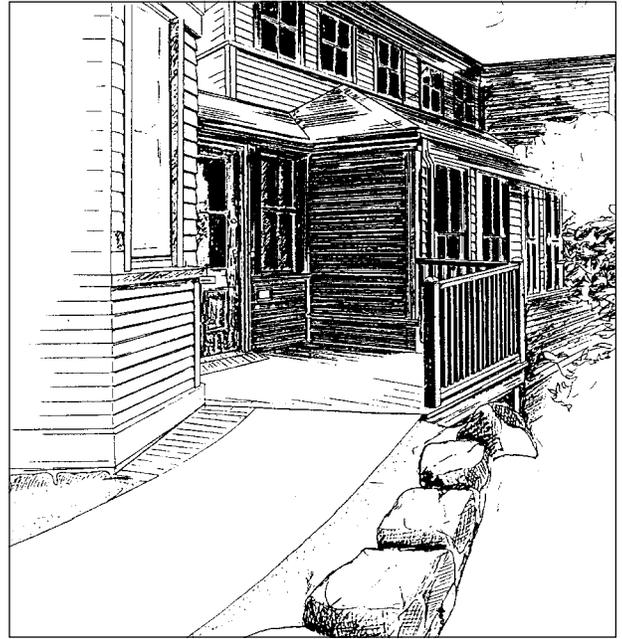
A sketch of the proposed universal access design, which raises the elevation of the historic entrance porch to meet the threshold, and includes a new walkway with an accessible gradient. Frederick Law Olmsted National Historic Site. (NPS, 1995)
